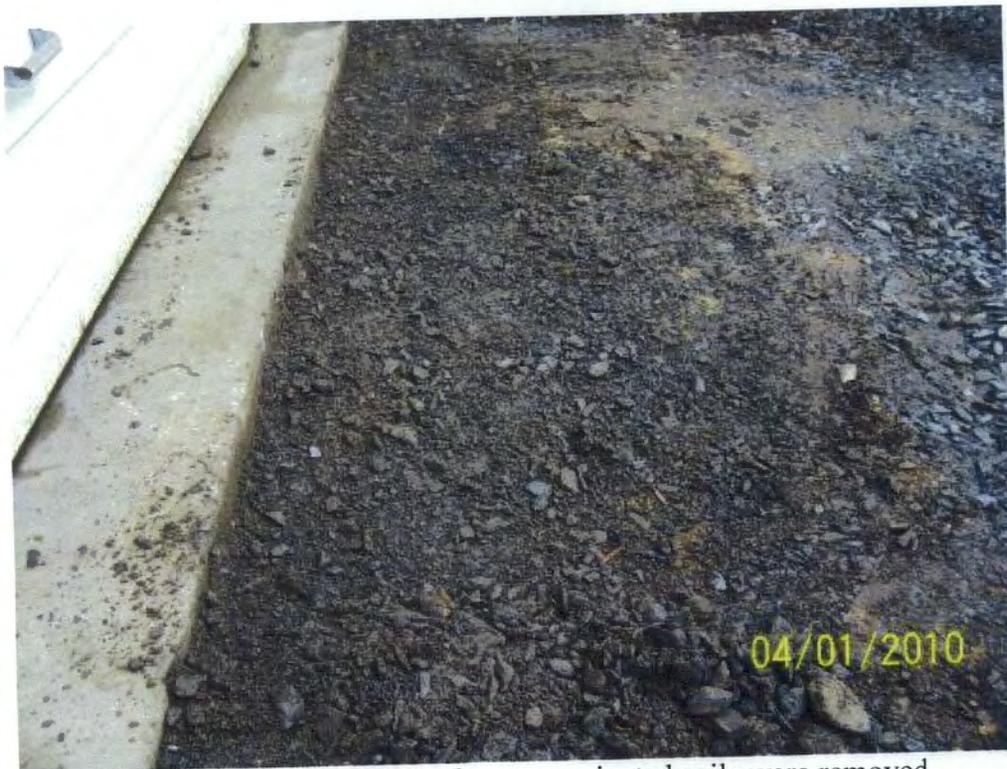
Showing a portion of the driveway with the facility garage door (note facility is attached to residence).
